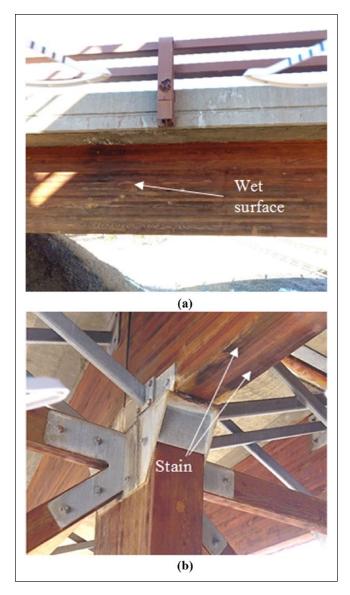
Girder damage detected using the UAS: (a) moisture damage on the side of Girder 4 between South Abutment and Joint I and (b) stains under Girder 3 at Joint I.
